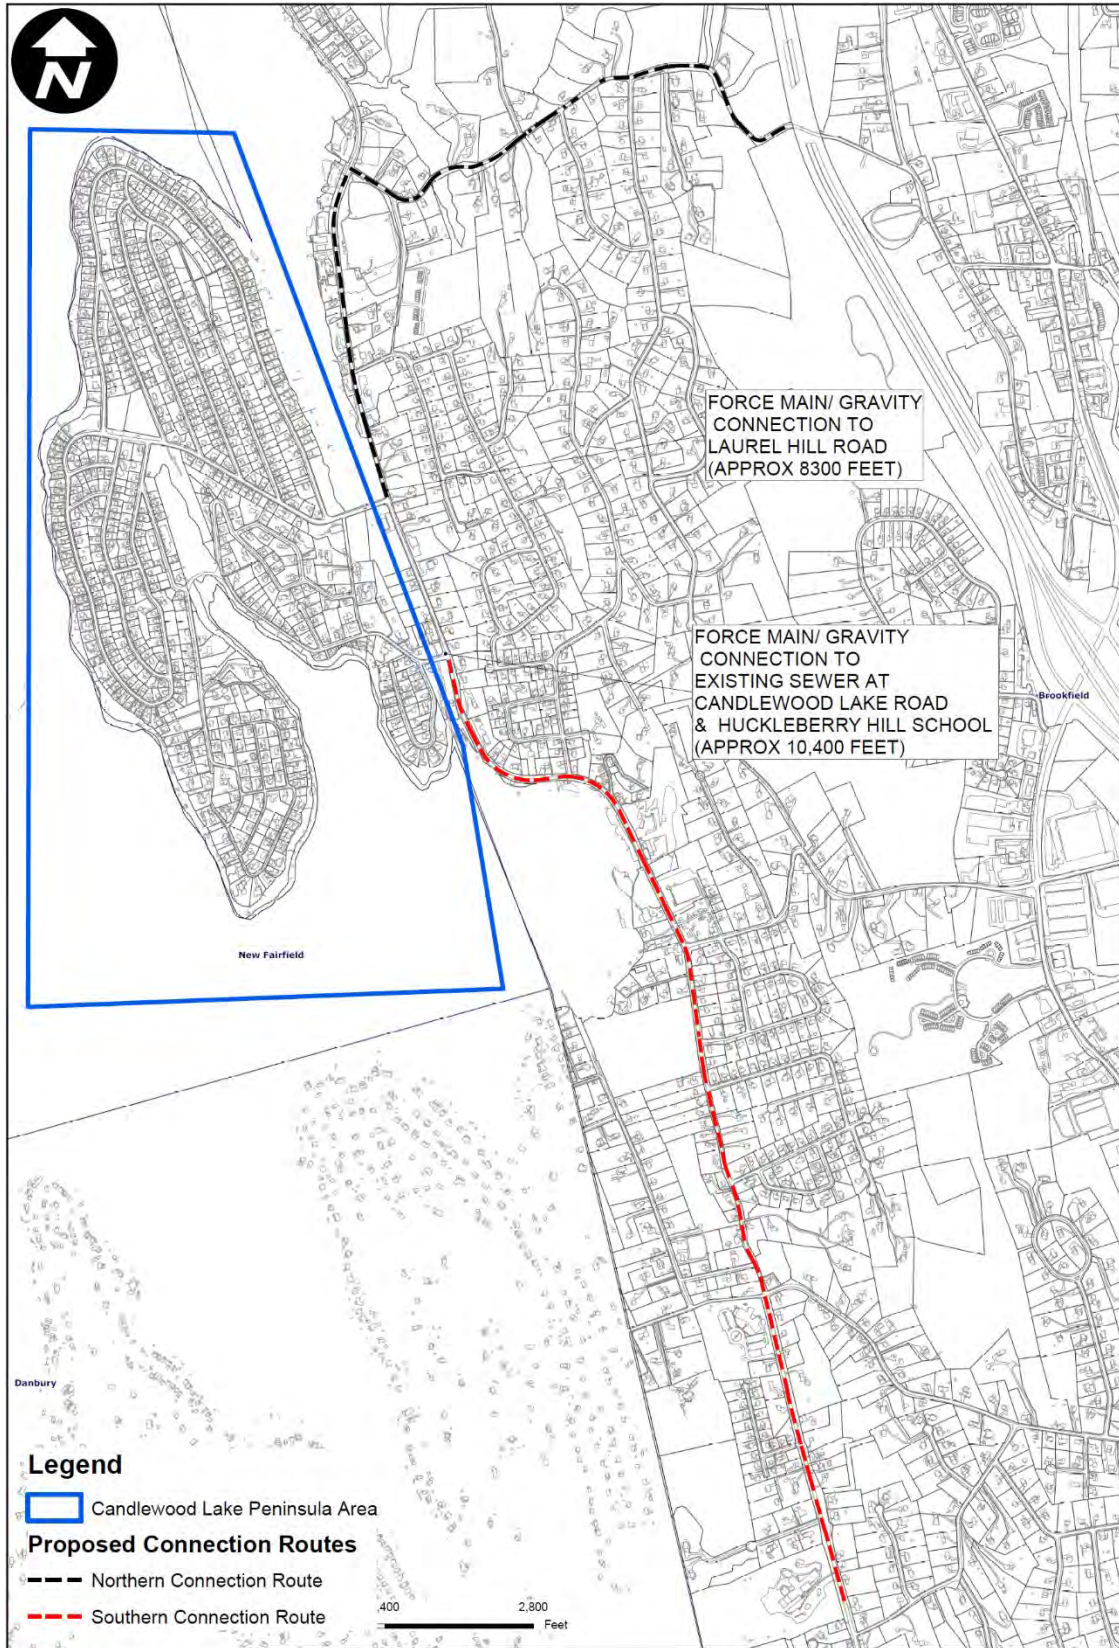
Proposed Sewer System Connections to Danbury or Laurel Road Site
